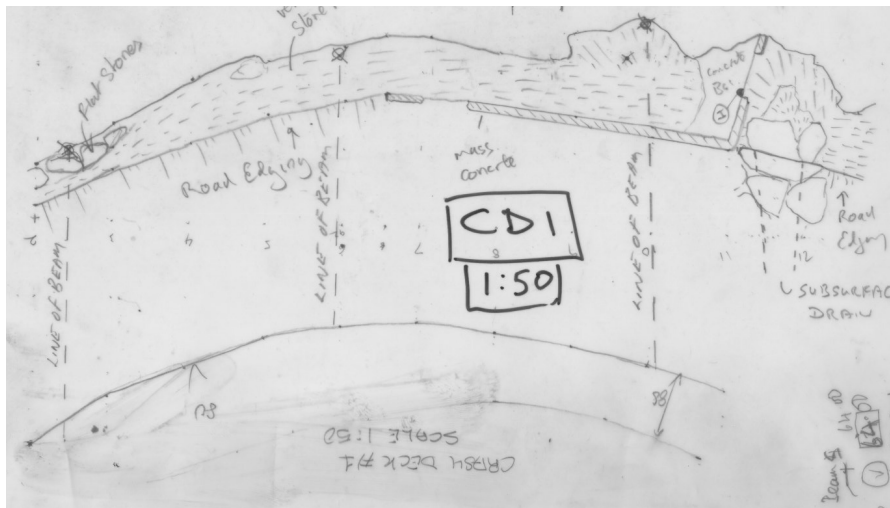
Scan of field plan of the roadway features at Crash Deck 1.
